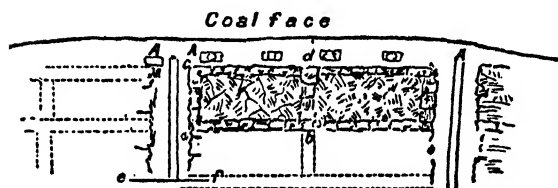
PLAN OF PILLARING ON LONGWALL FACE.
